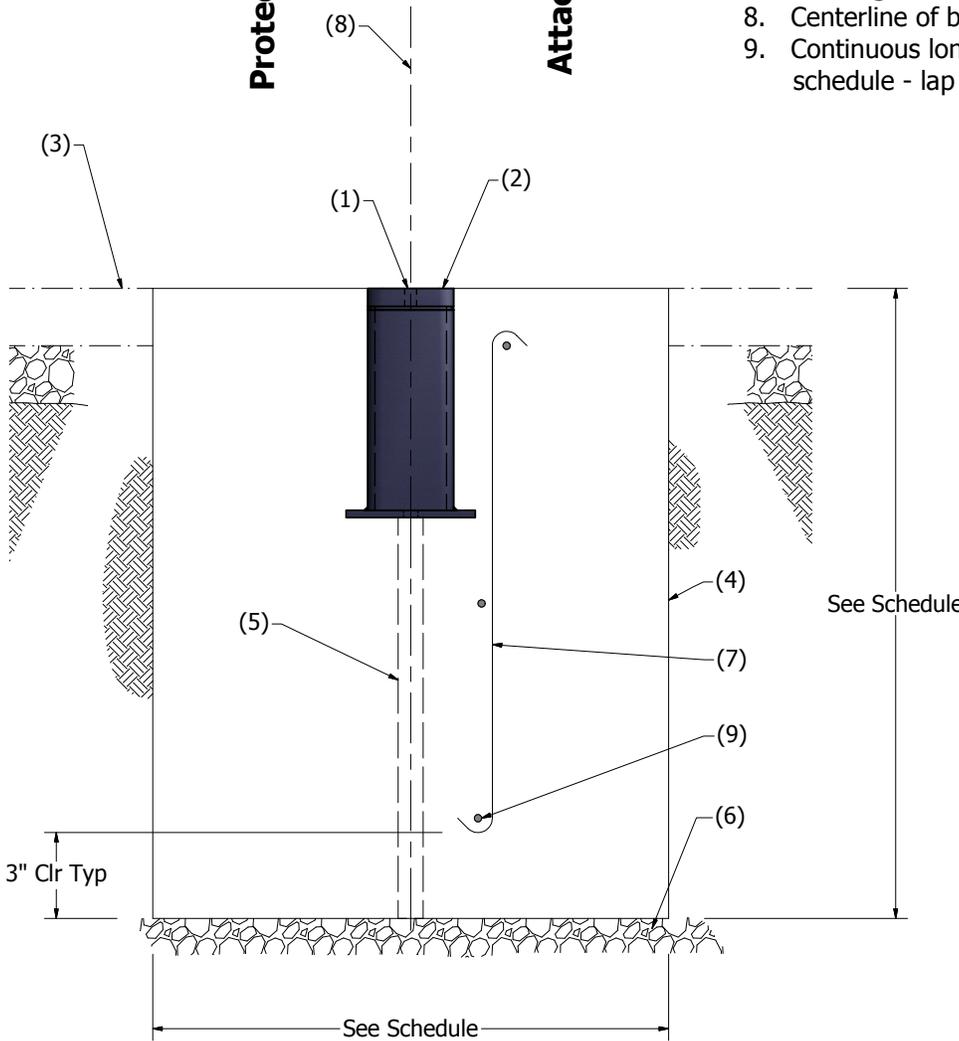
Created 9/13/2022	 MaxiForce™ Traffic Control Bollards 7560 Main Street Sykesville, MD 21784 410-552-9888 (phone) - 410-552-9939 (fax) www.maxiforcebollards.com - sales@maxiforcebollards.com
